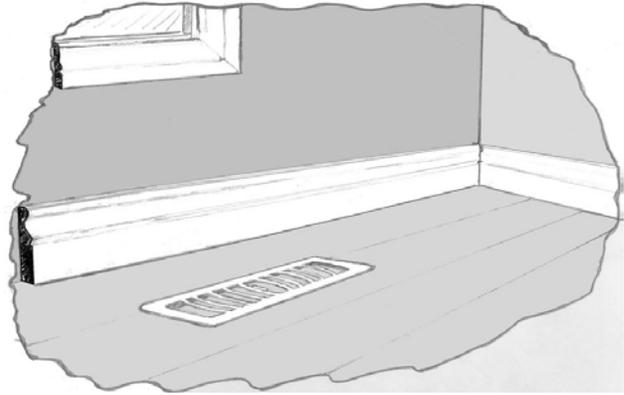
Perimeter Supply Outlet with Floor Diffuser
